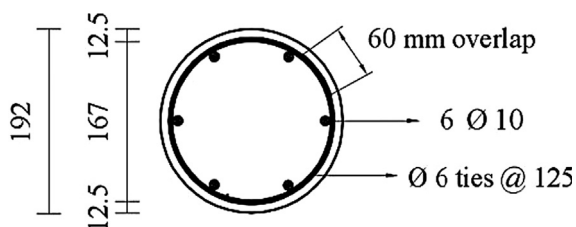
Cross-sectional details of test columns (dimensions and bar diameters are in mm).
